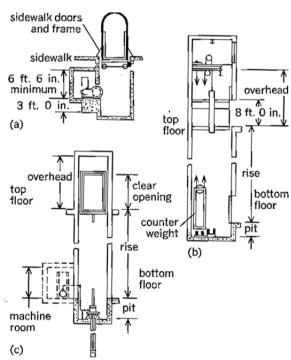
Three types of industrial elevator. (a) Side-walk elevator. (b) Heavy-duty freight elevator. (c) Hydraulic electric elevator
